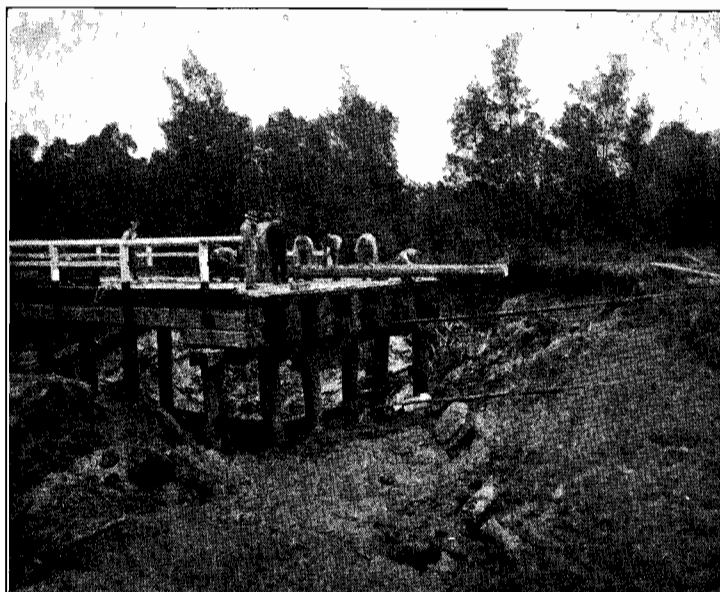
Showing damage by floods at bridge over the Bunyip River on the Prince's Highway.
